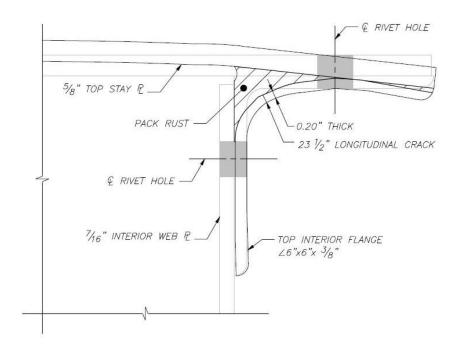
Top Interior Flange Angle Deformation & Longitudinal Crack Location,  $L_3L_4$ , Span 12, SE Truss.
